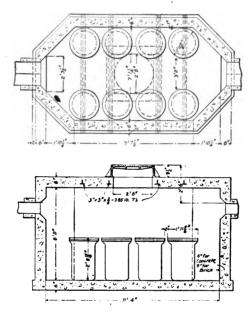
Vault Size 11, Used for Installing 8 Loading Pots on Conduit Runs when not Intersected.
